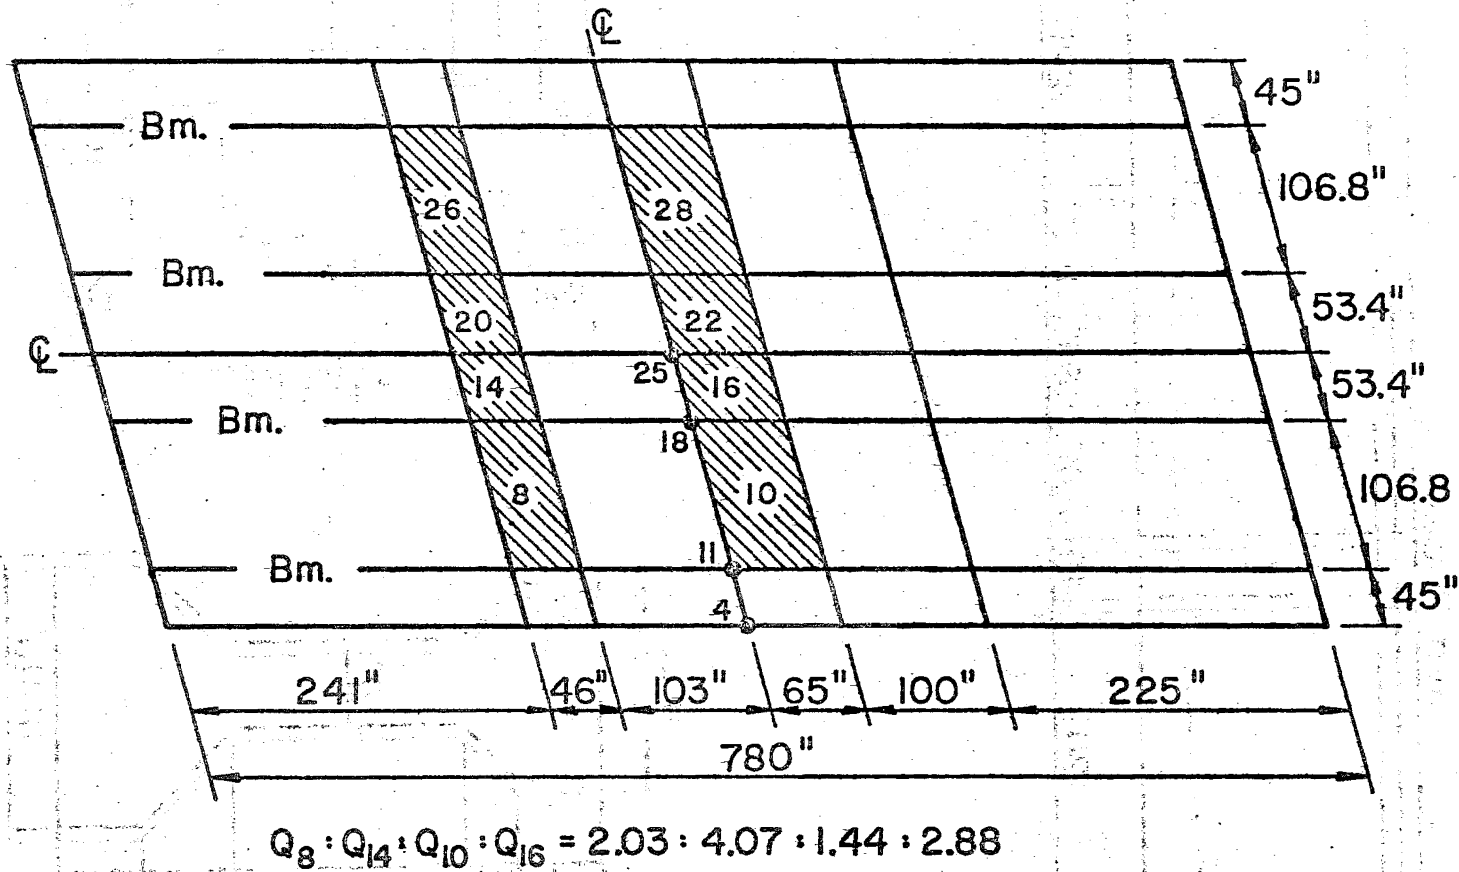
Example No. 1 (Bridge 2): Finite Element Discretization and Loading
